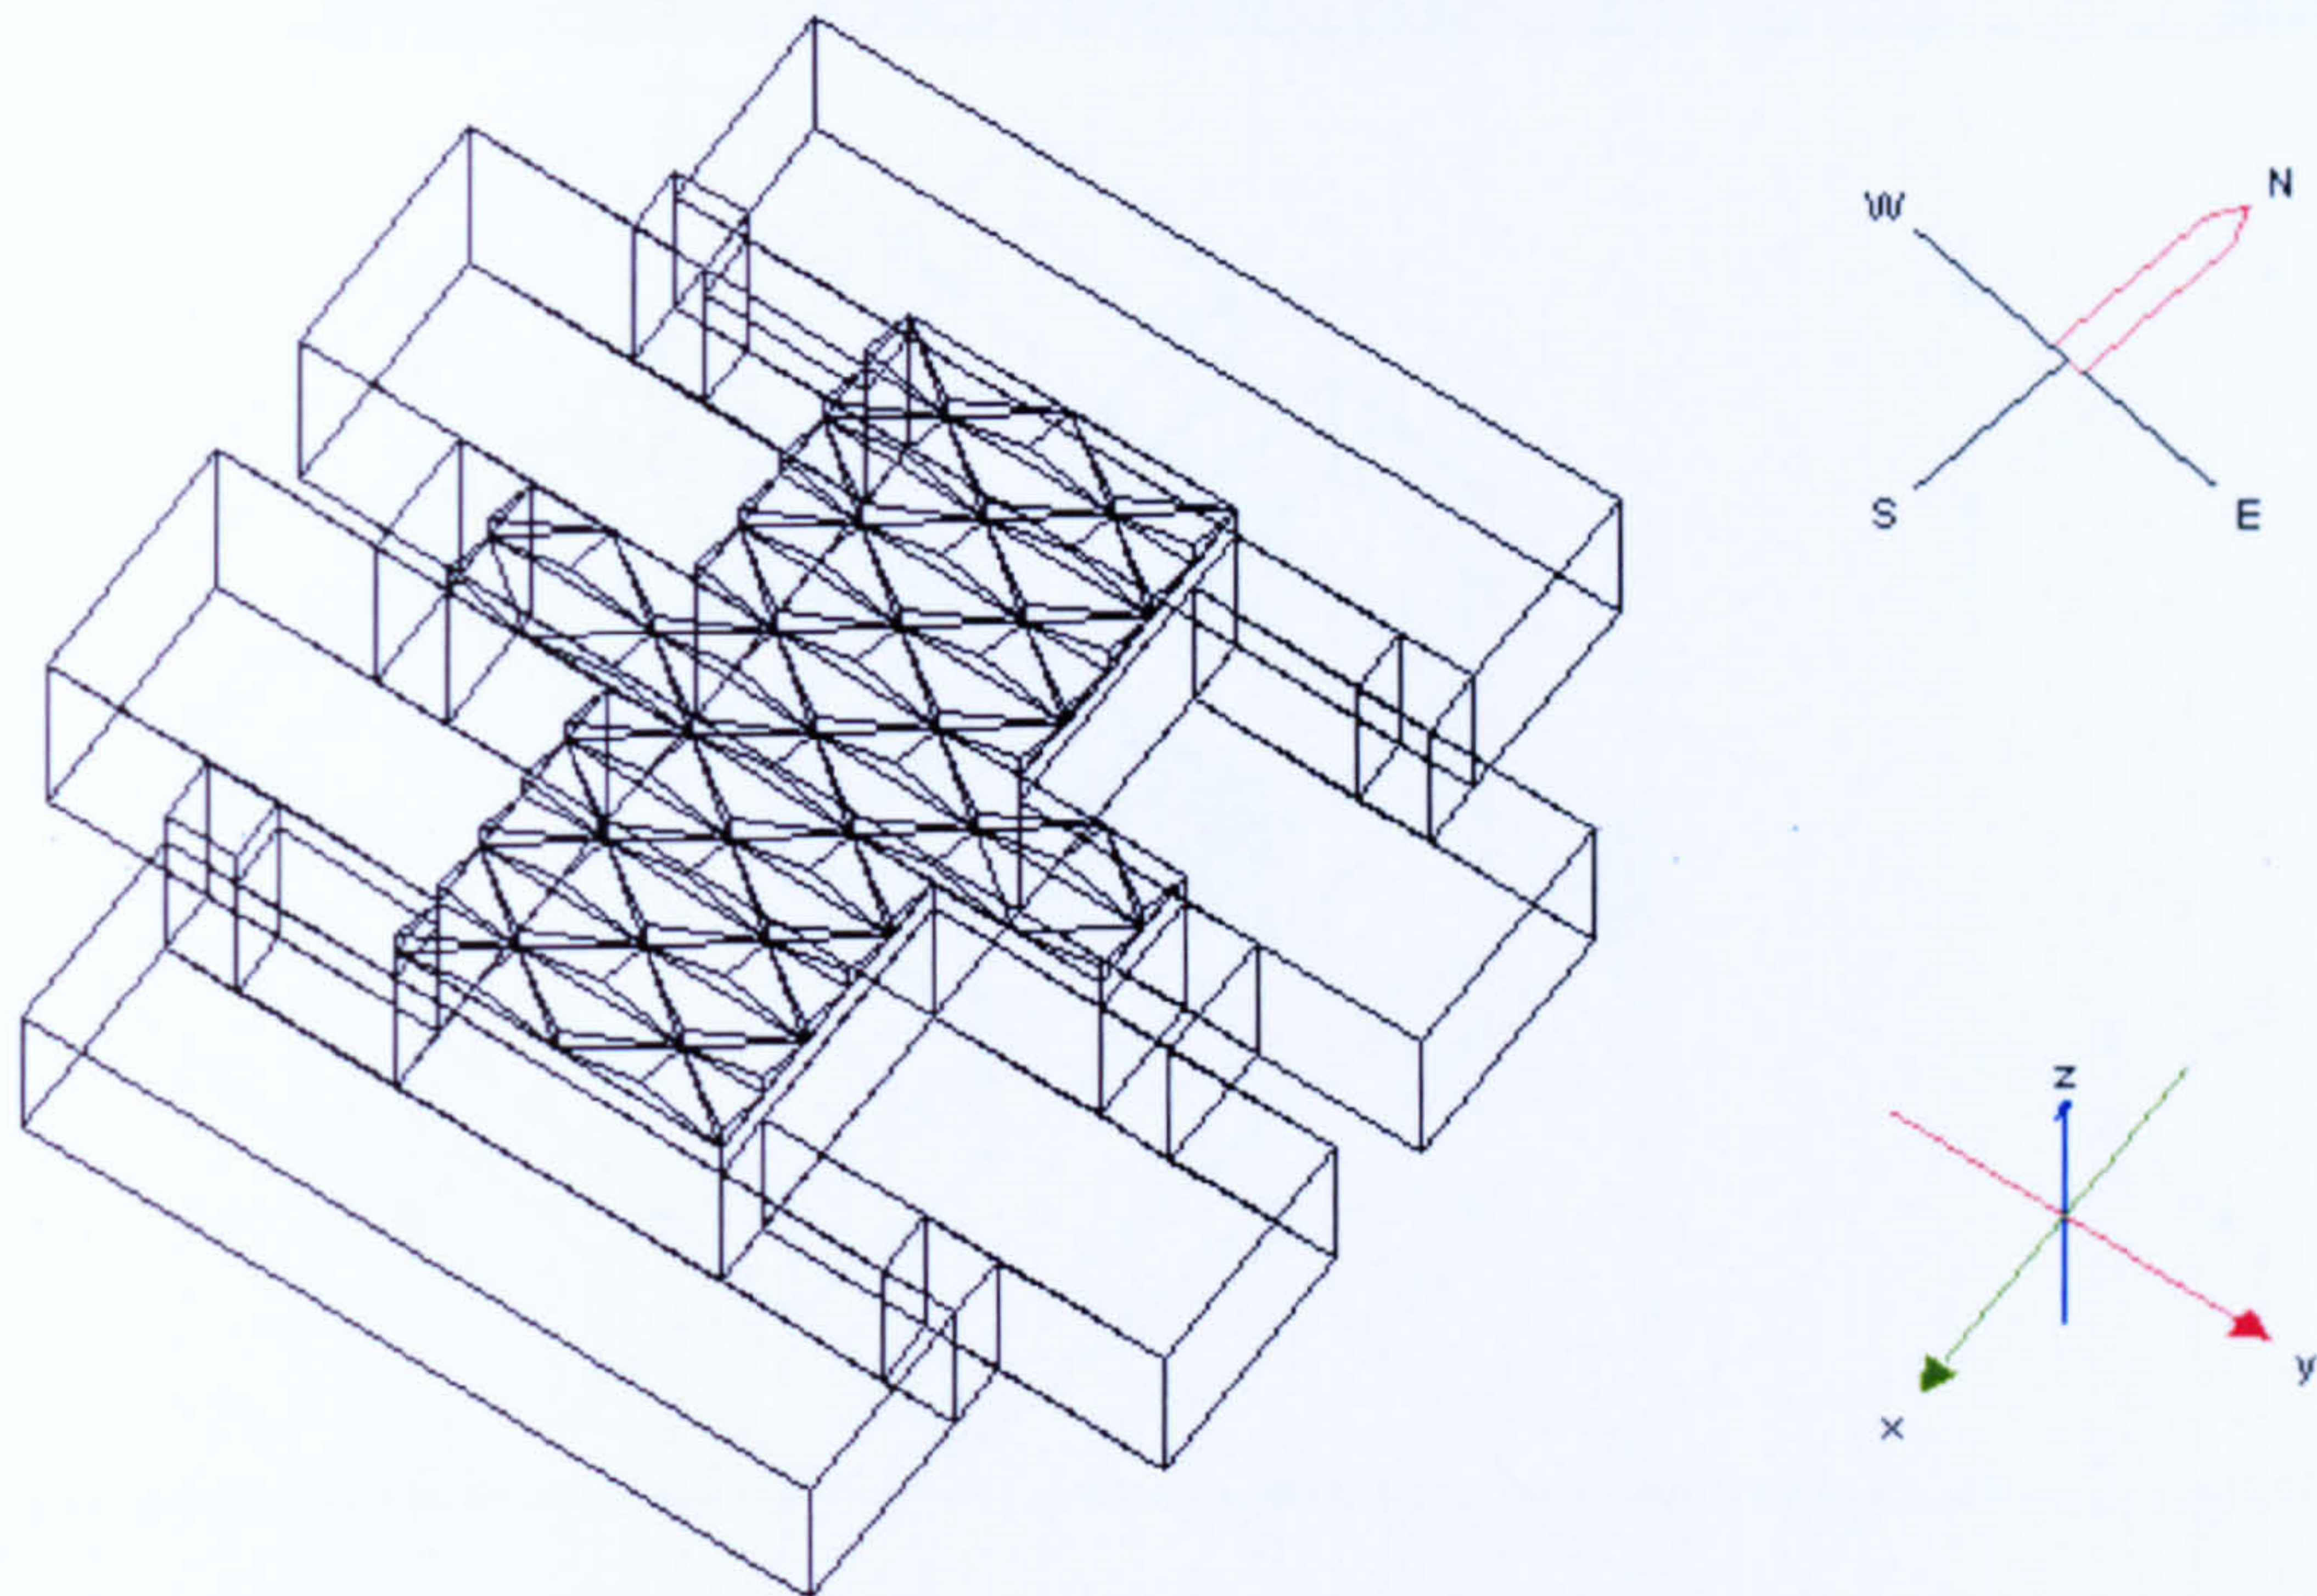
22: The model of the atrium building with the atrium roof as it is constructed
